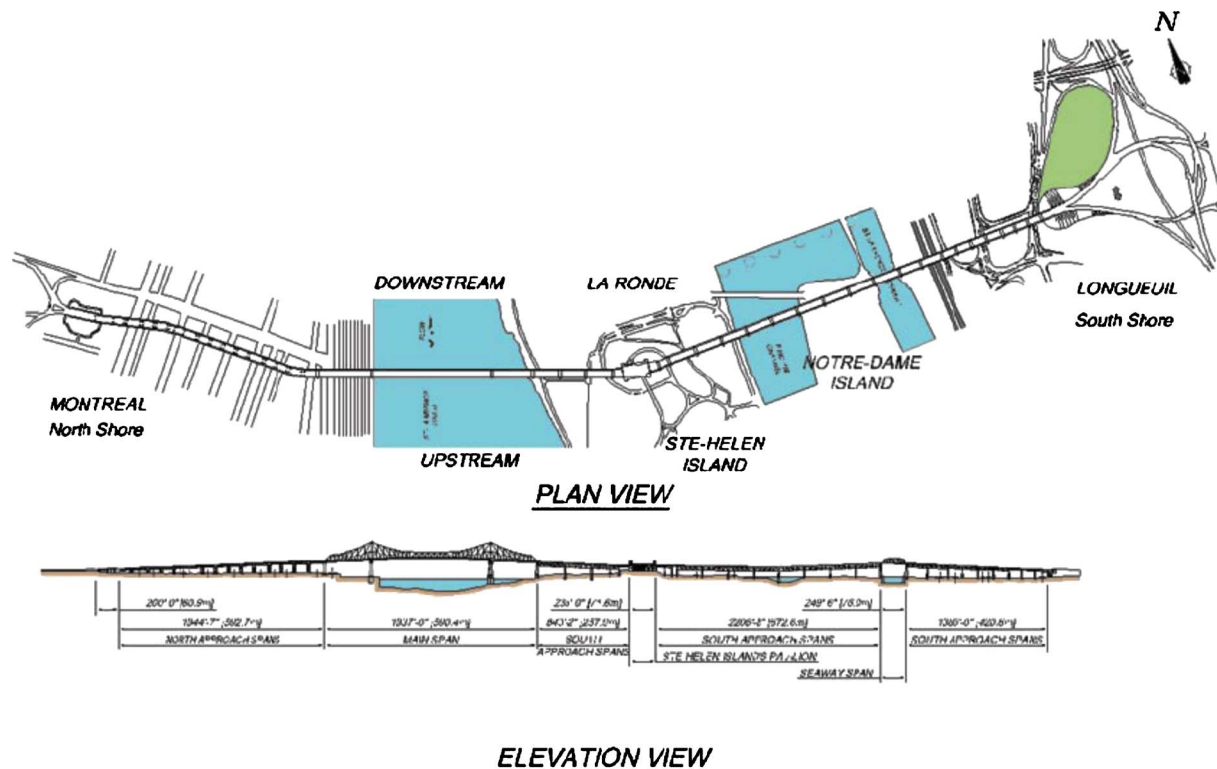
Plan and elevation views of Jacques Cartier Bridge (PJCCI 2007)
